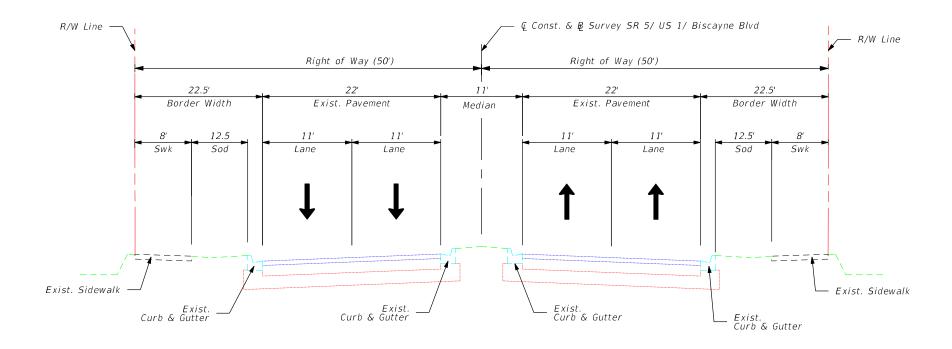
Existing Typical Section from NE 90th Street to NE 92nd Street
